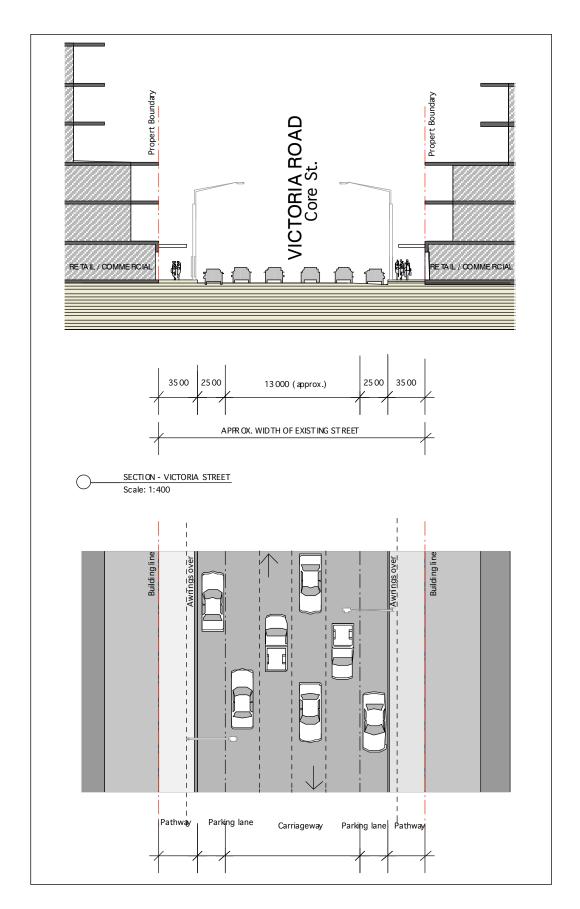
Victoria Road - Town Centre Precinct Section
